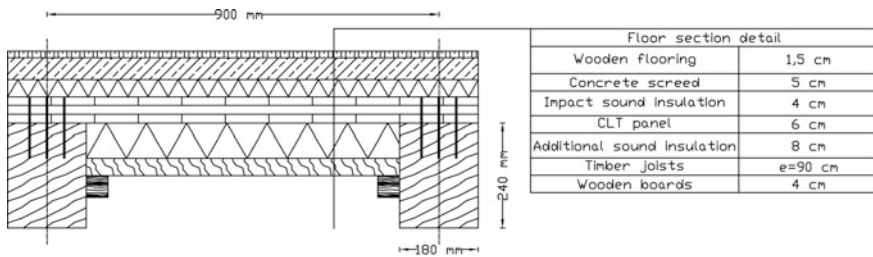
Existing timber beam strengthened with the CLT panel [76]
